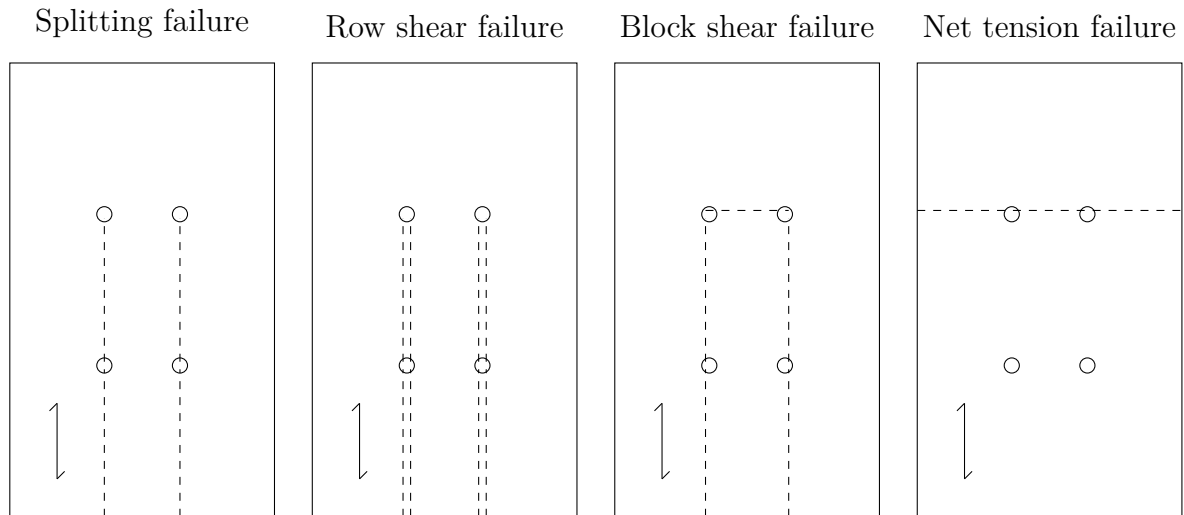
Schematic of brittle failure mechanisms of a fastener-type timber connection. Dashed lines represent where timber cracks appear.
